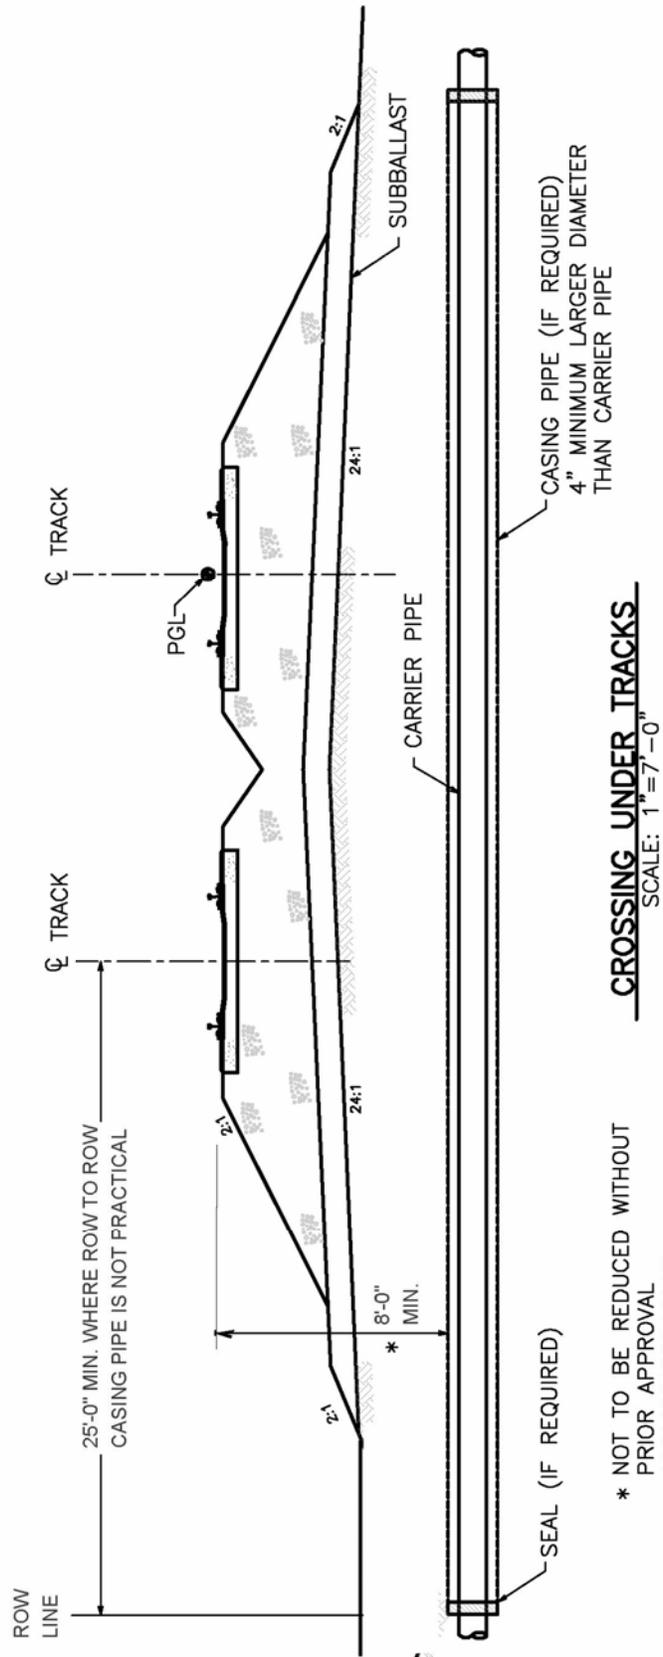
Typical Utility Crossing, Open Ballasted Track Section
